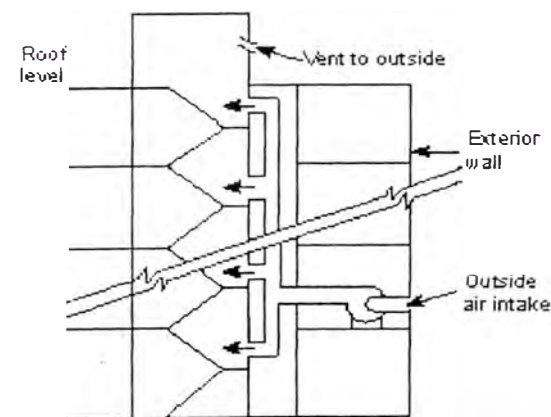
(b)(2) Stairtower pressurization with vent to the outside.
